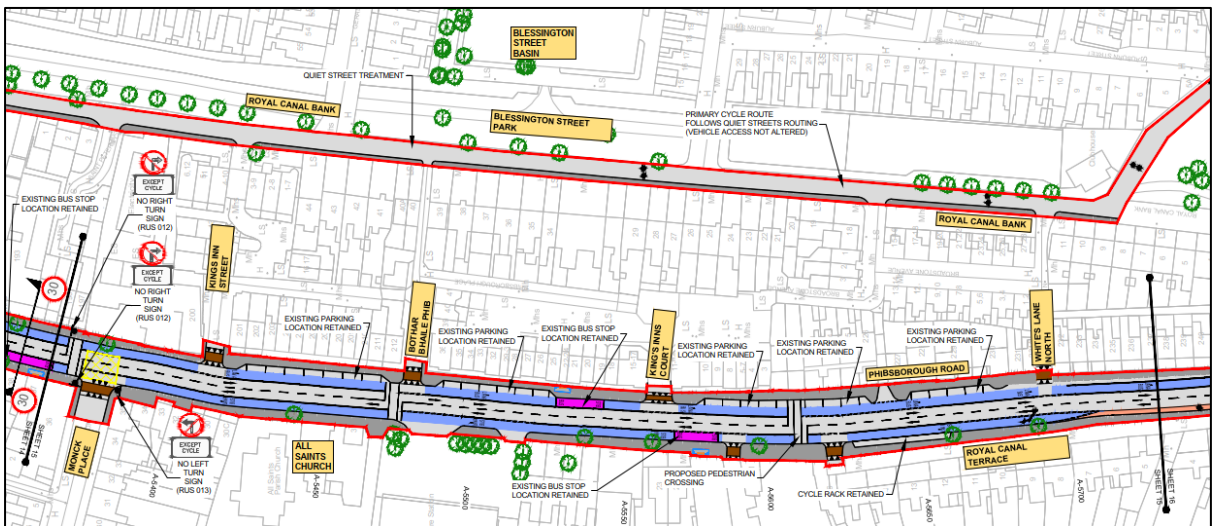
Extract from General Arrangement Drawing Sheet 15
